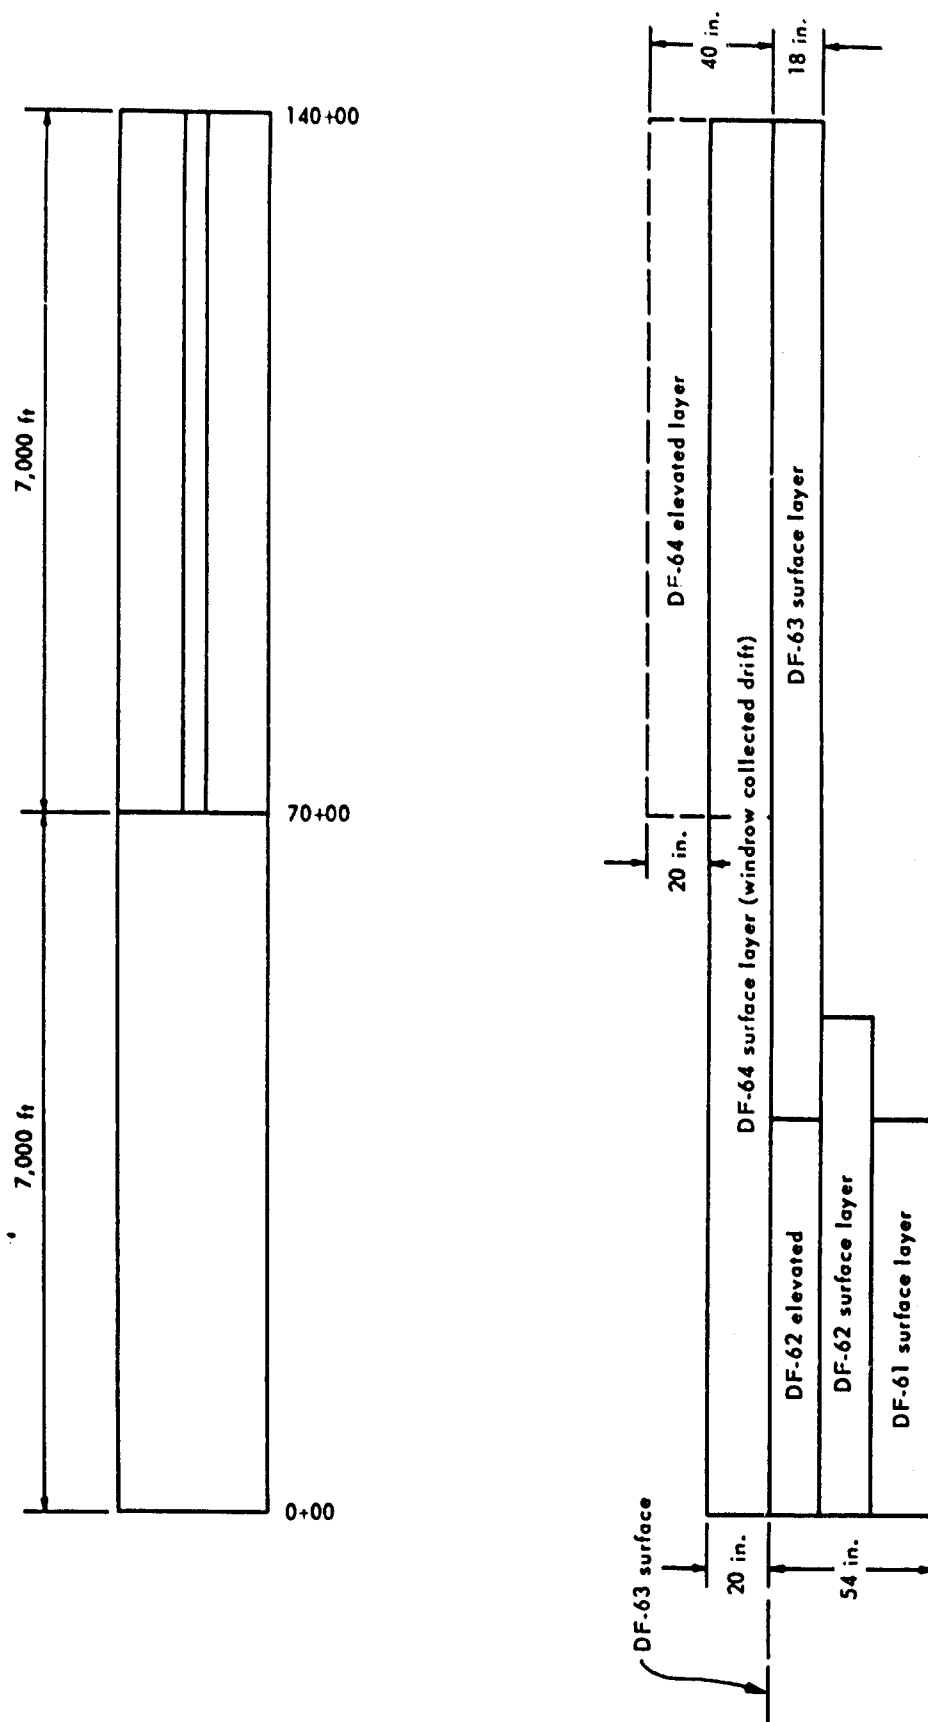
Longitudinal cross-section and plan of the DF-64 test area.
